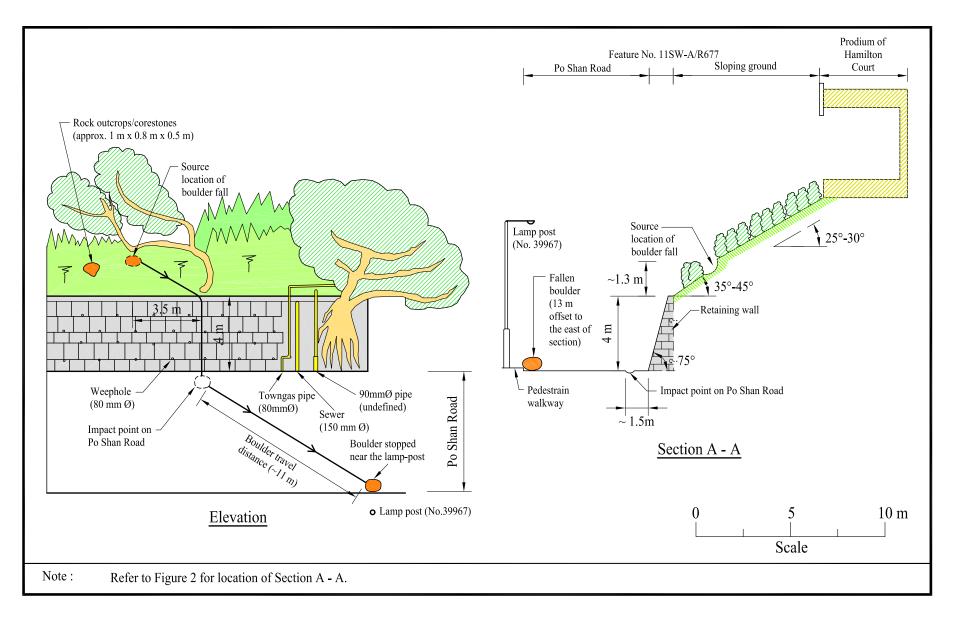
Elevation View and Cross-section A - A Through Boulder Fall Trajectory
